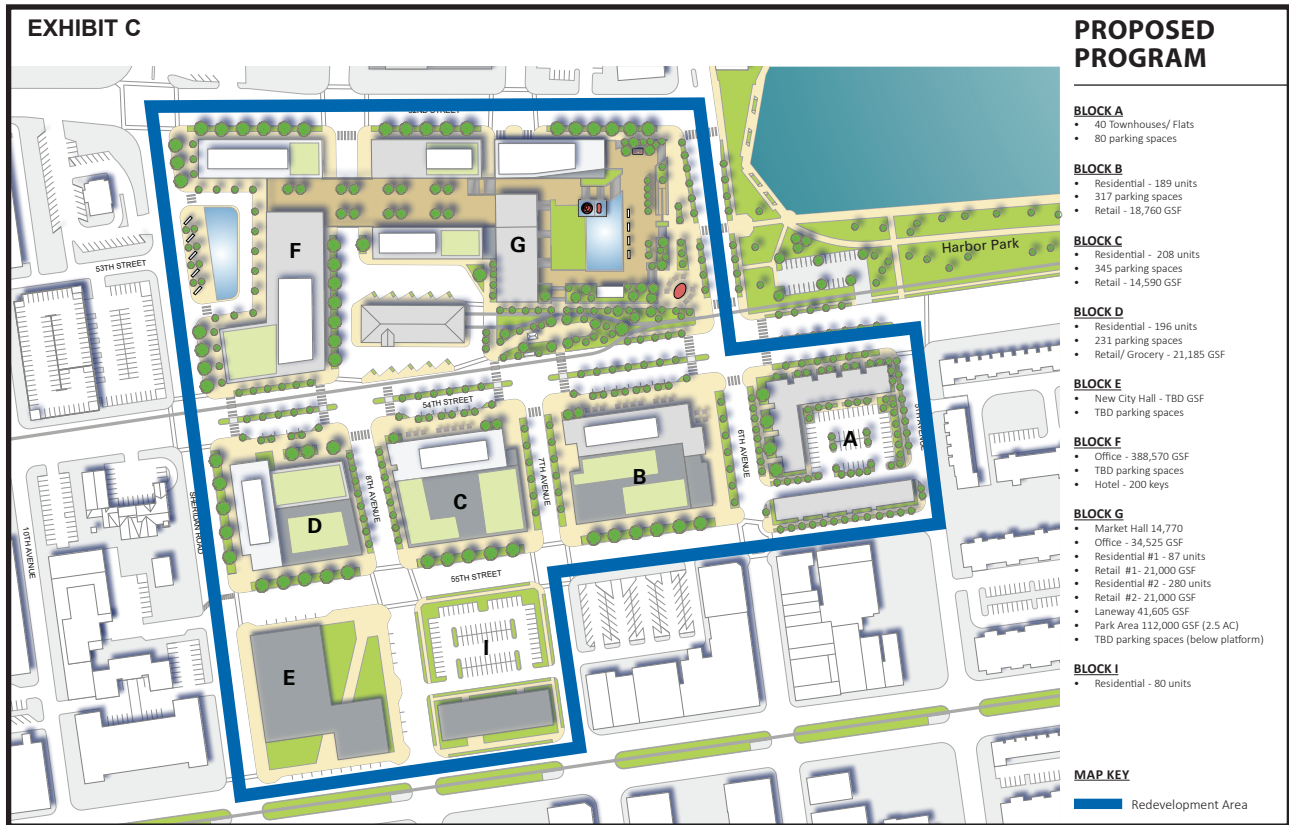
Development Illustration One: Mixed Building Types, Covered Parking for Water Street area in Racine, Wisconsin
